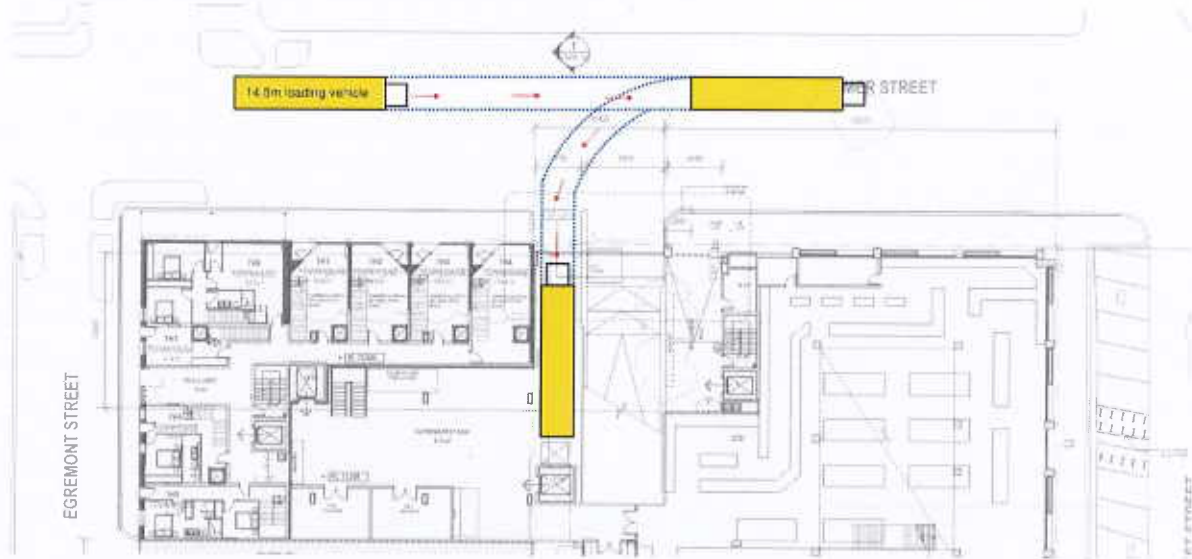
Ground Floor Loading Dock Flow Diagram for 14.5 metre vehicle – Ingress
